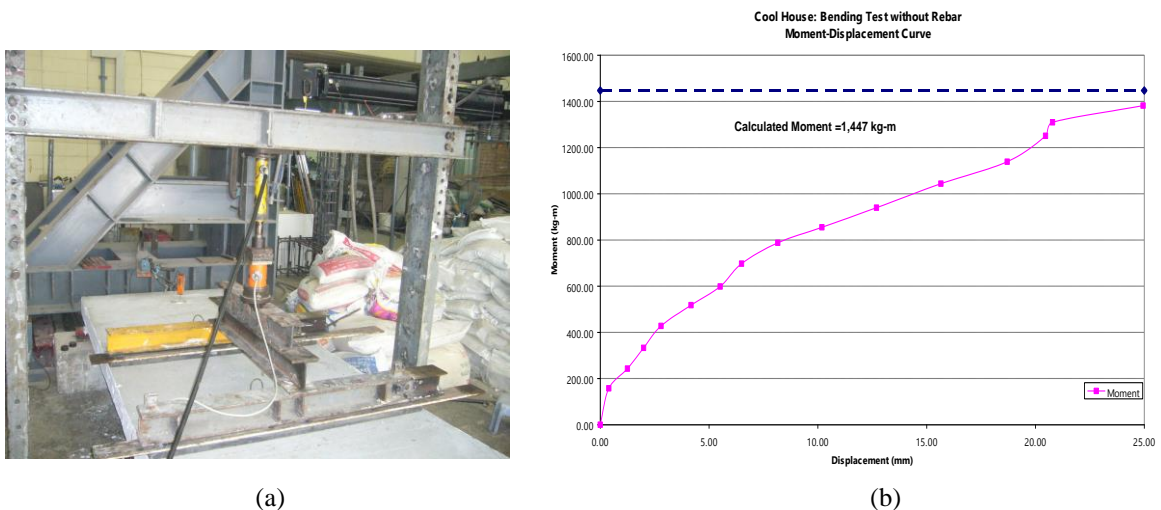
a) Static Bending test of slab without rebar; and b) Test Result; Moment and Deflection relationship.
